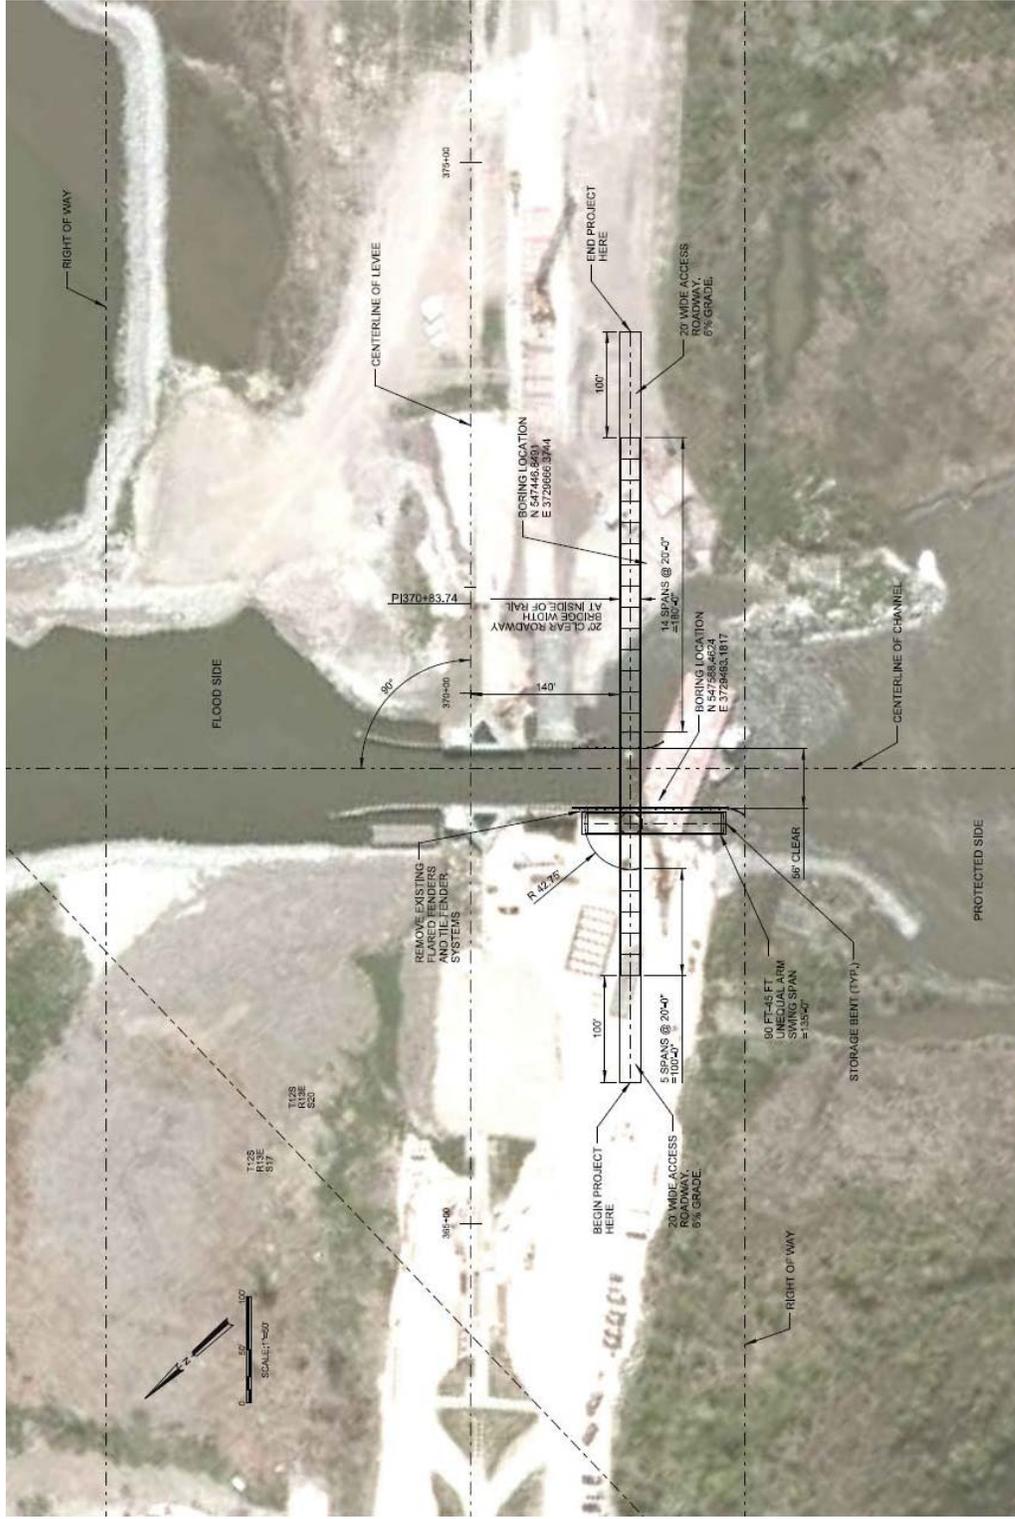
Proposed Bayou Bienvenue protected side 135 ft x 16 ft swing span bridge.
